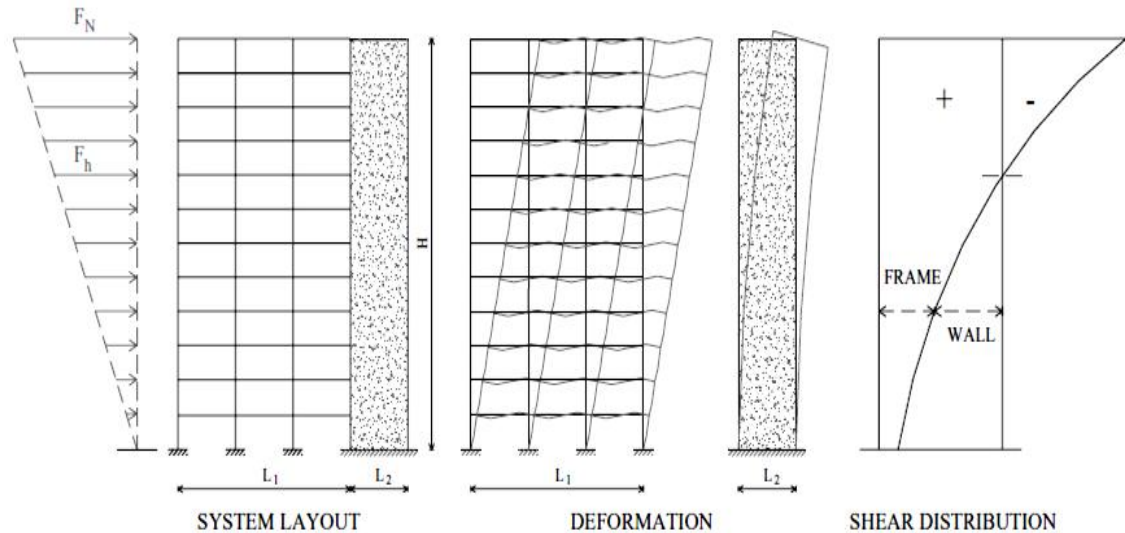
Typical hybrid frame, interaction between frame and structural wall
